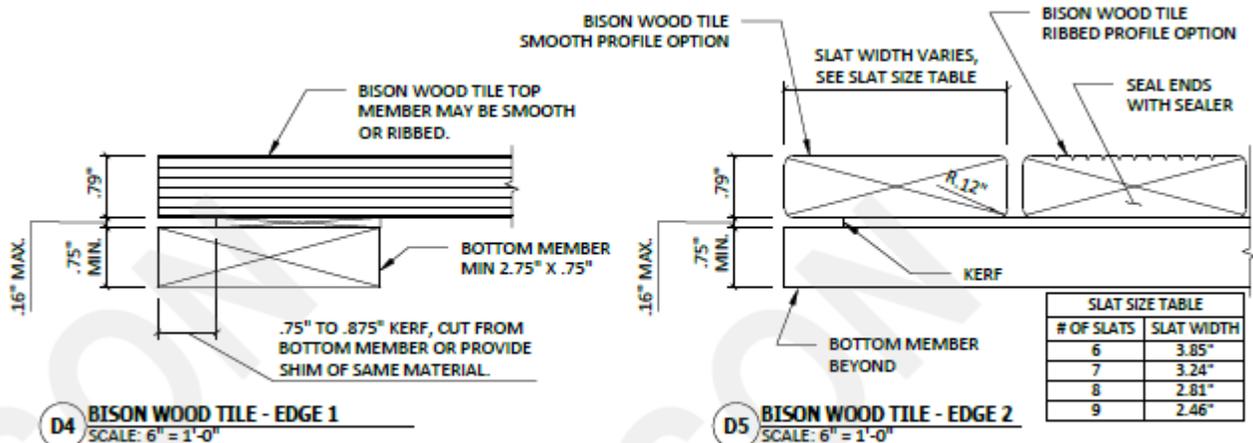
BISON WOOD TILE DETAILS (Example)
